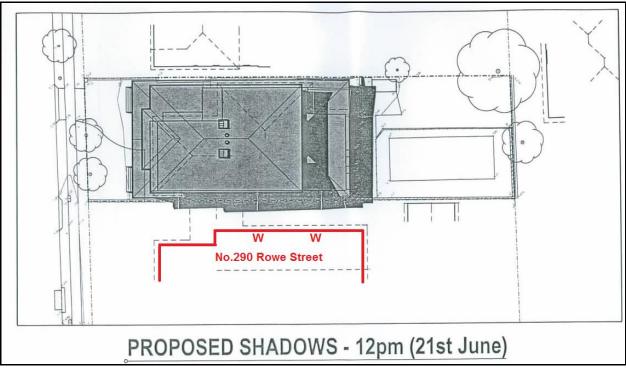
Plan demonstrating proposed level of overshadowing at 12pm on June 21. As can be seen the eastern facing side windows are free from overshadowing at 12pm on June 21 (winter solstice).
